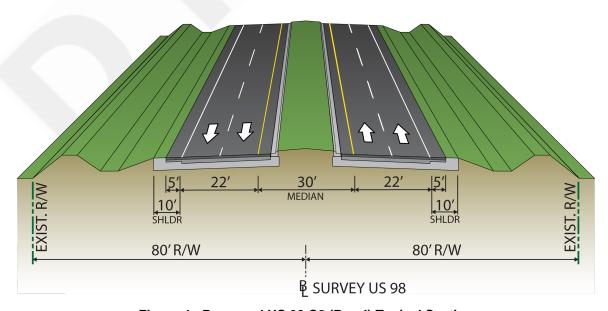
Proposed US 98 C2 (Rural) Typical Section
